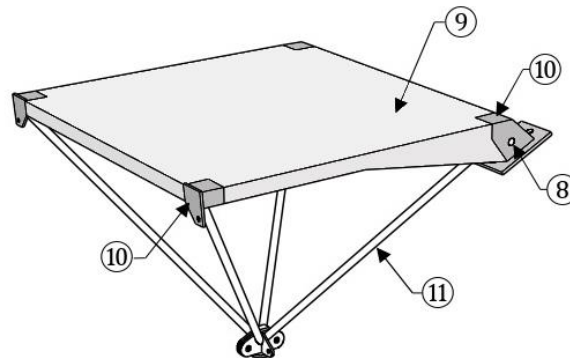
The composite steel and concrete outside unit with openings through which the prestressed reinforcement is passed
